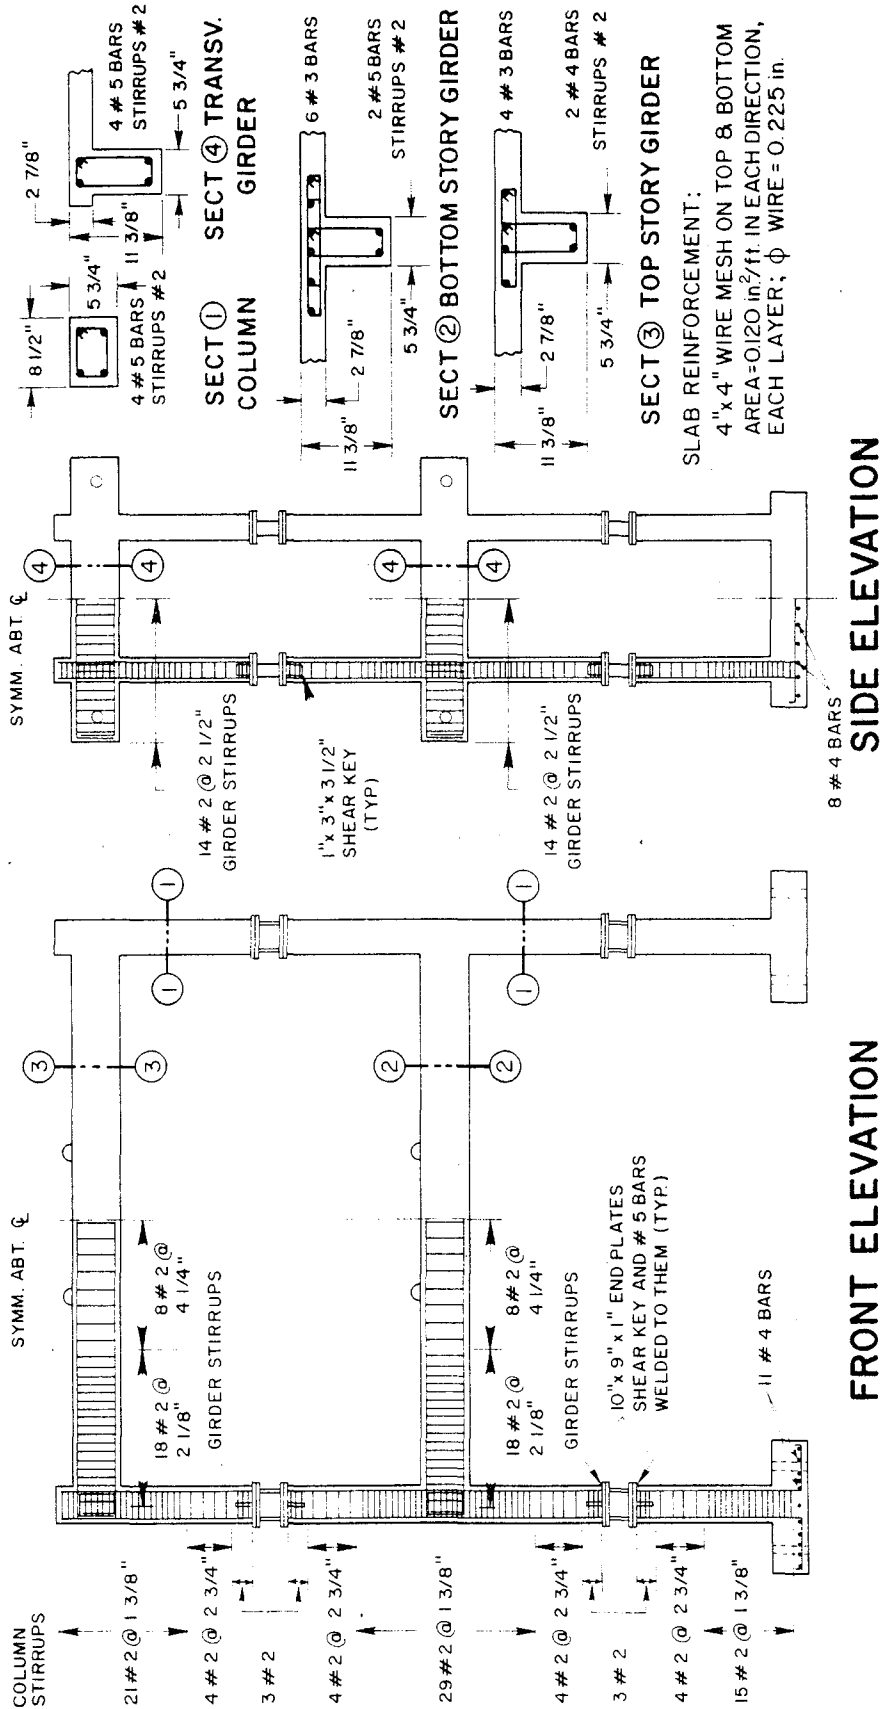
TEST STRUCTURE - DETAILS OF REINFORCEMENT
